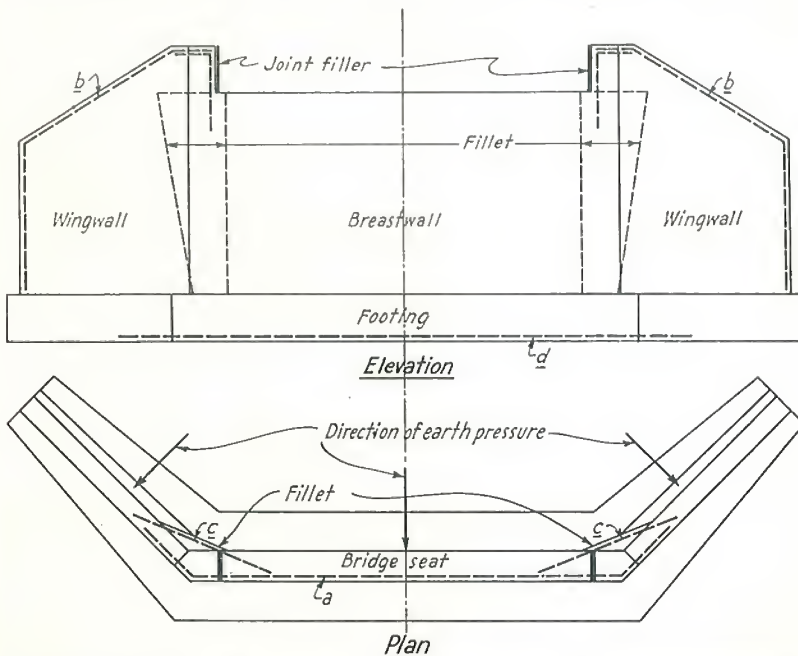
Common abutment type, reinforced and strengthened. The ordinary abutment reinforcement is not shown.
